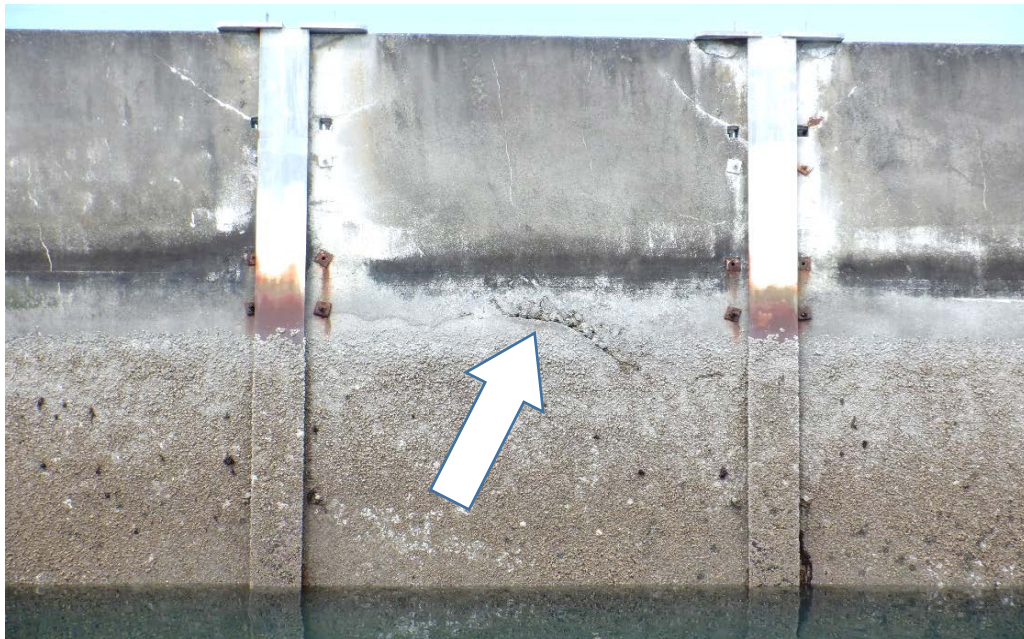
East Breakwater, Exterior Face, Piles No. 24 and No. 25 - Inspection noted this apparent form void in the center of the concrete panel. Close examination found that the area has been repaired in the past with grout. Partial dis-bondment of the grout was evident, however no exposed reinforcing or rust bleeding was noted.
